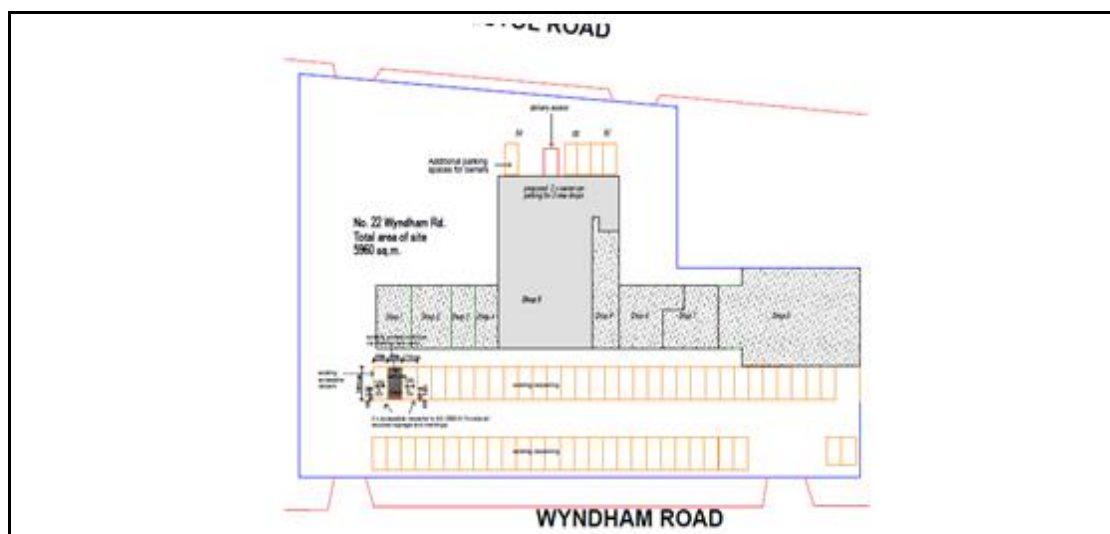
Parking Layout PLN- 16-279 – Philip Stary Architect
